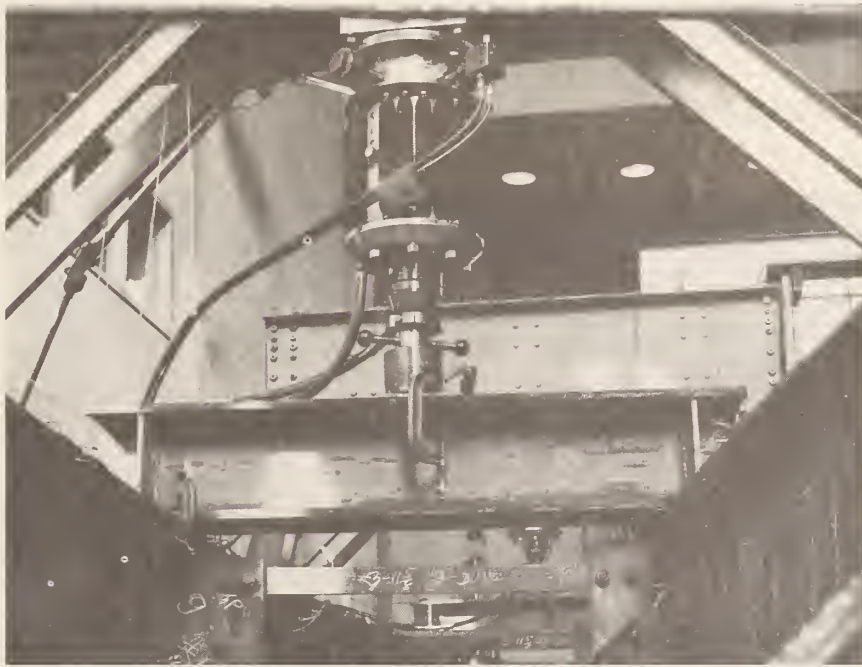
Location of Hydraulic Jacks on Load Beam
